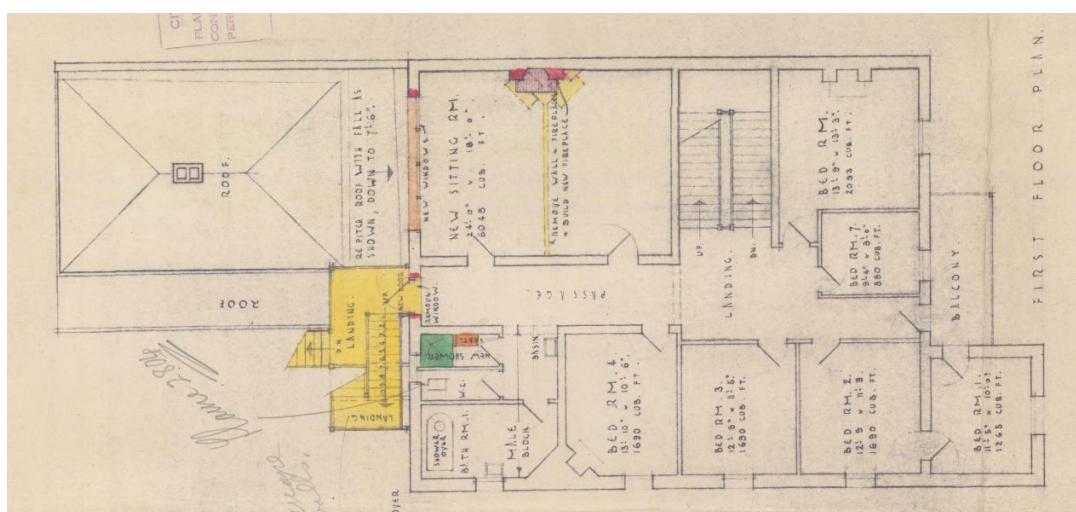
First floor plan in 1954. Note new fire escape (yellow) and rear windows (orange) proposed. (BP 3930, 1954)
